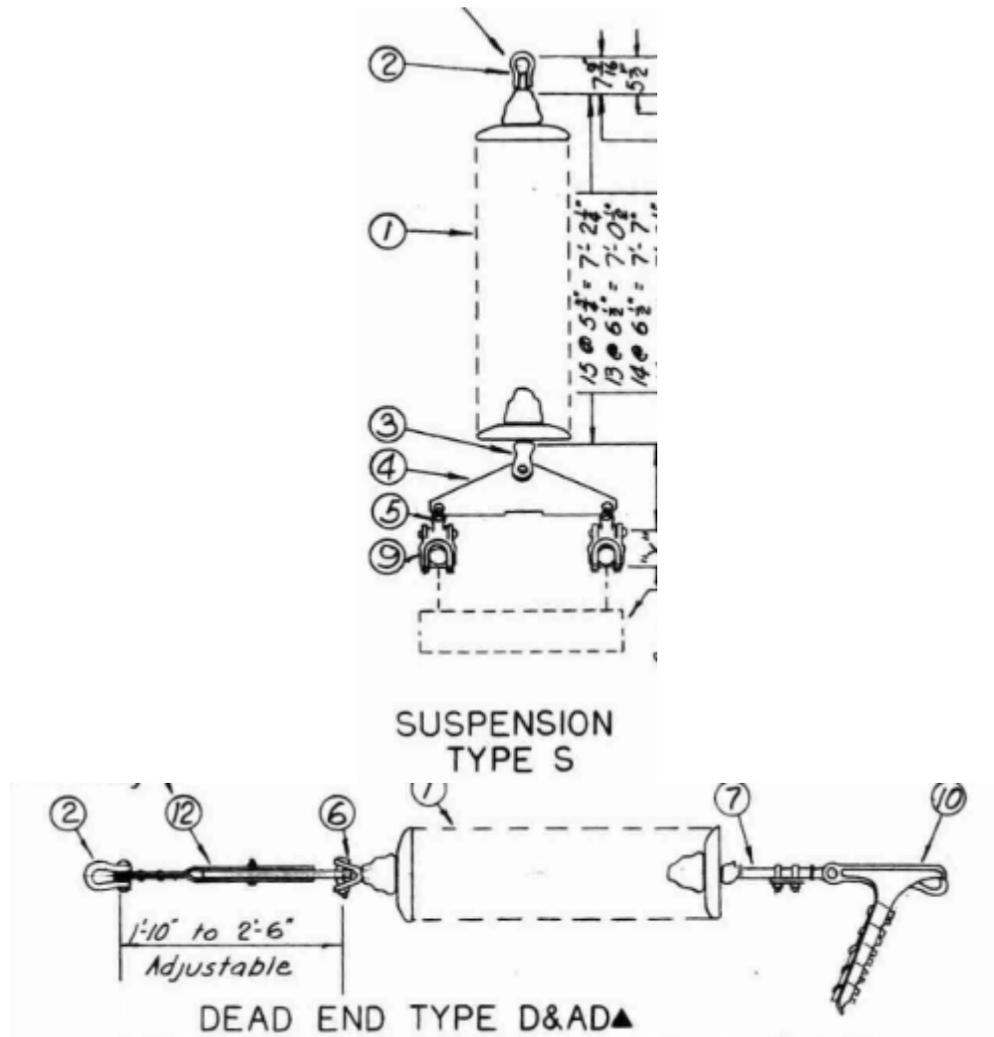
Design drawings of suspension and dead end type insulator configurations⁶¹
